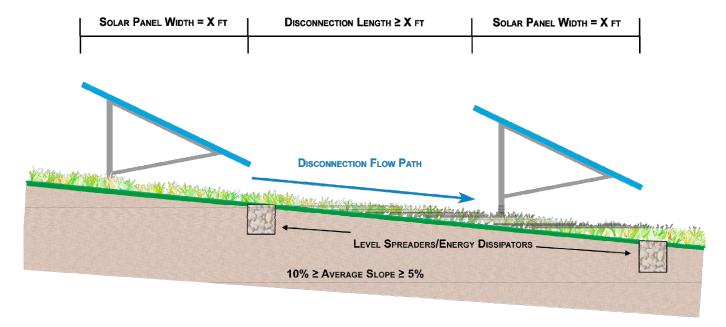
Typical Installation – Slope ≥ 5% but ≤ 10%
